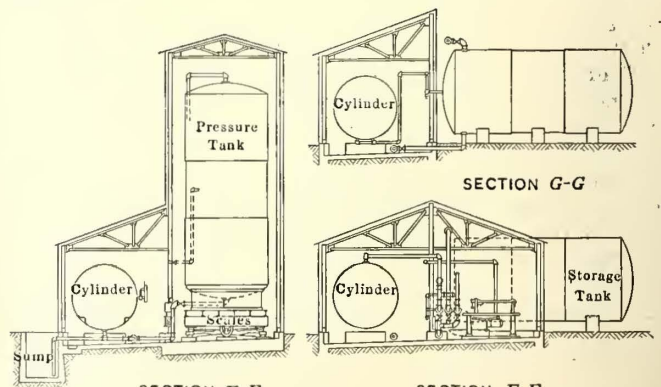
CROSS-SECTIONS OF CYLINDER HOUSE
